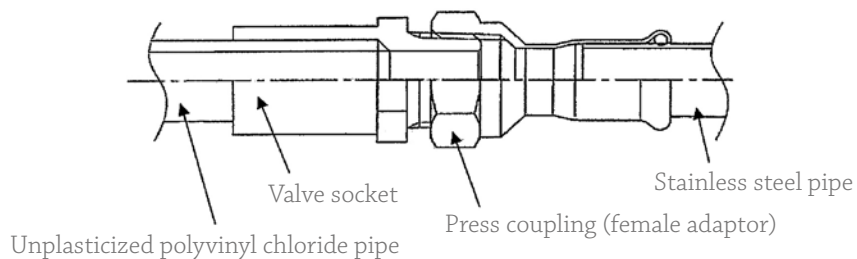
Connection using stainless steel adaptor and valve socket
